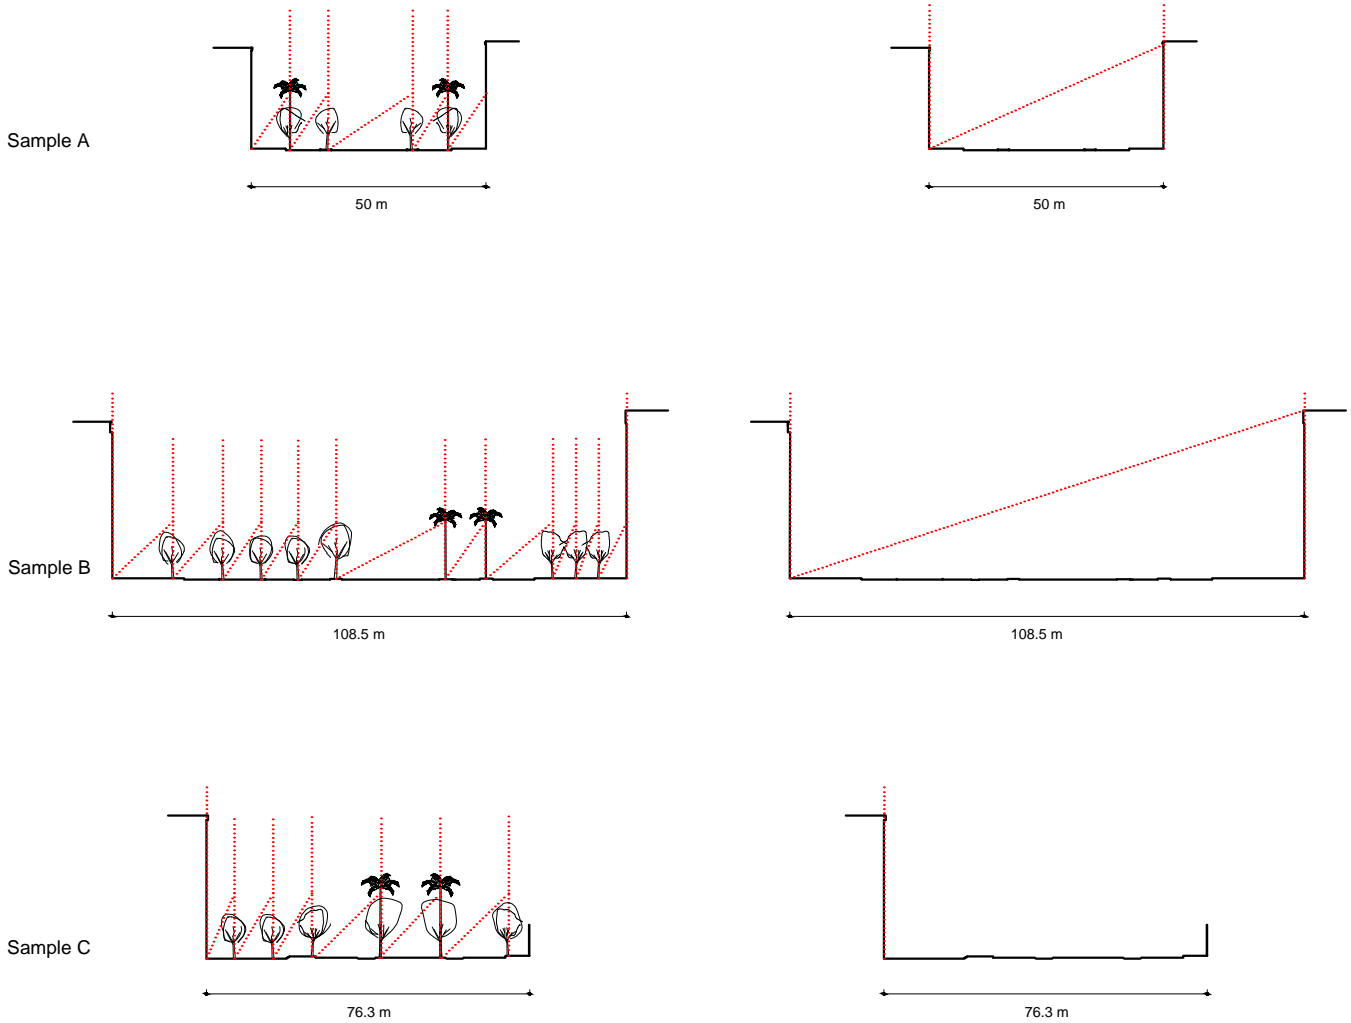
Cross-sections of the three selected samples show the street width and building height ratio. (Source: Author's Edition).
